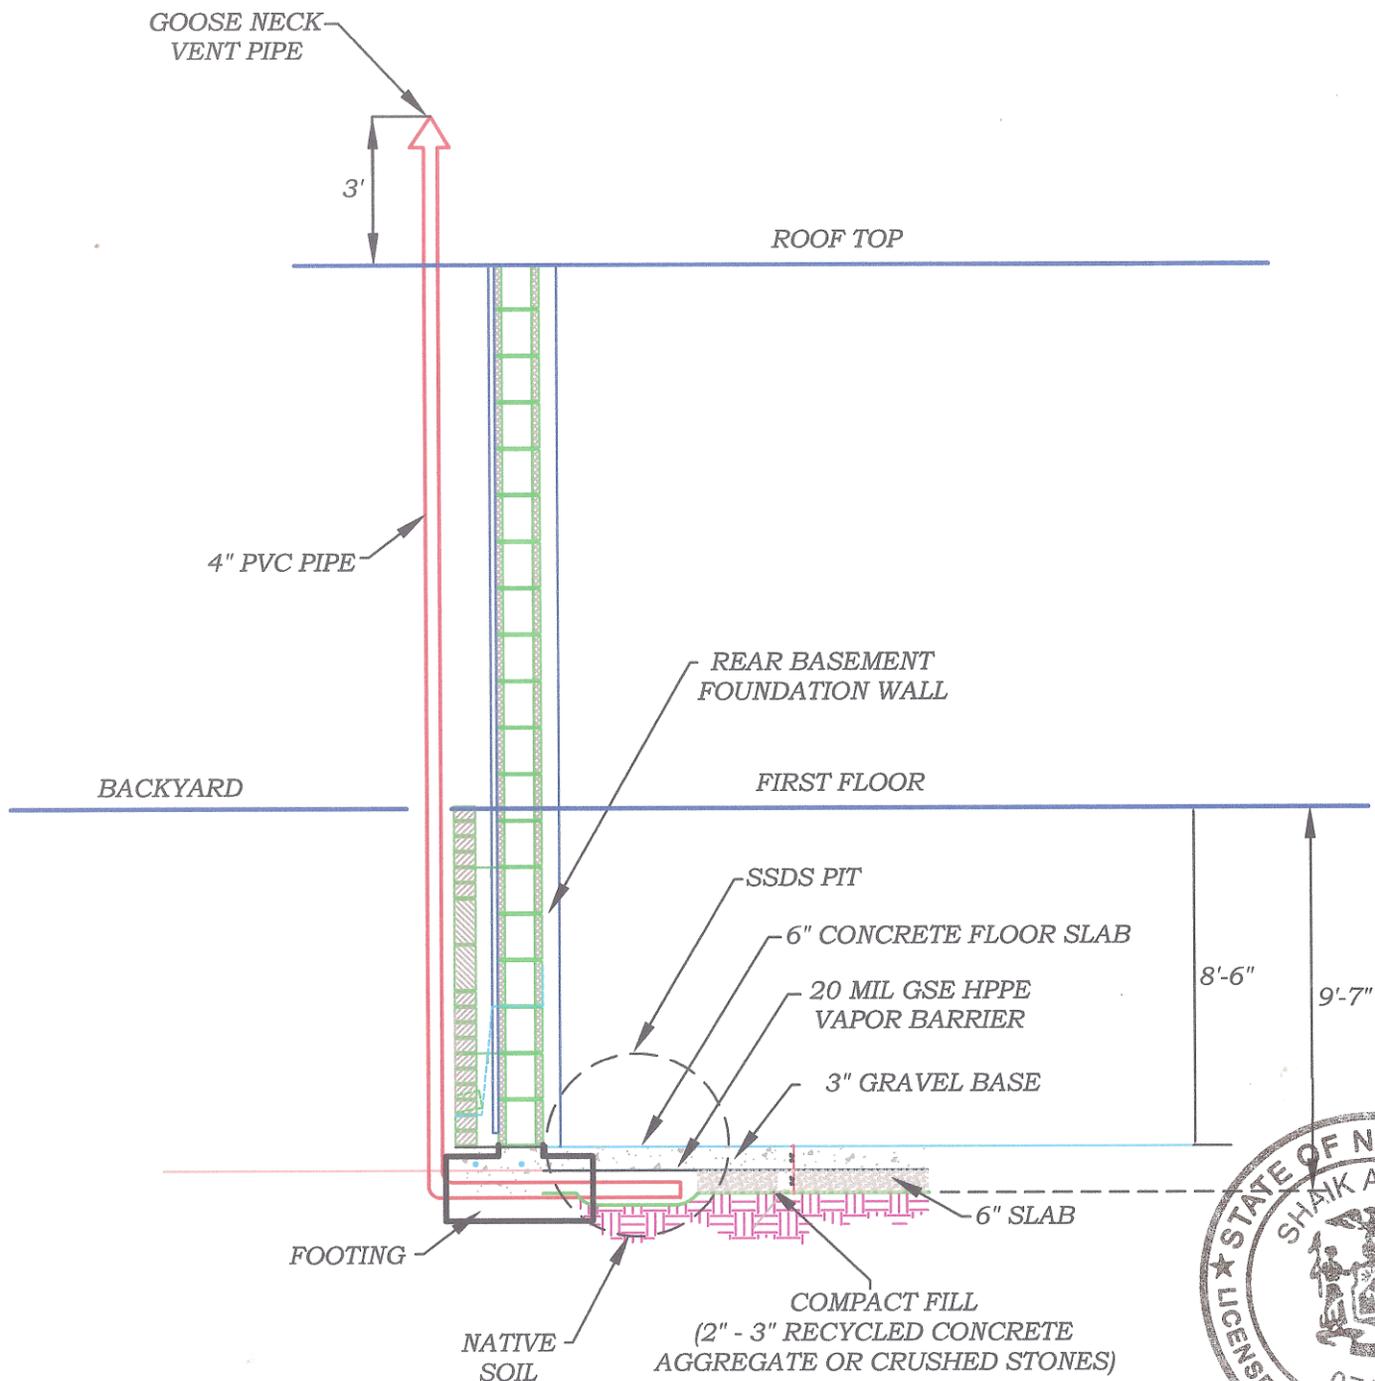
SUBSLAB DEPRESSURIZATION SYSTEM DETAIL
